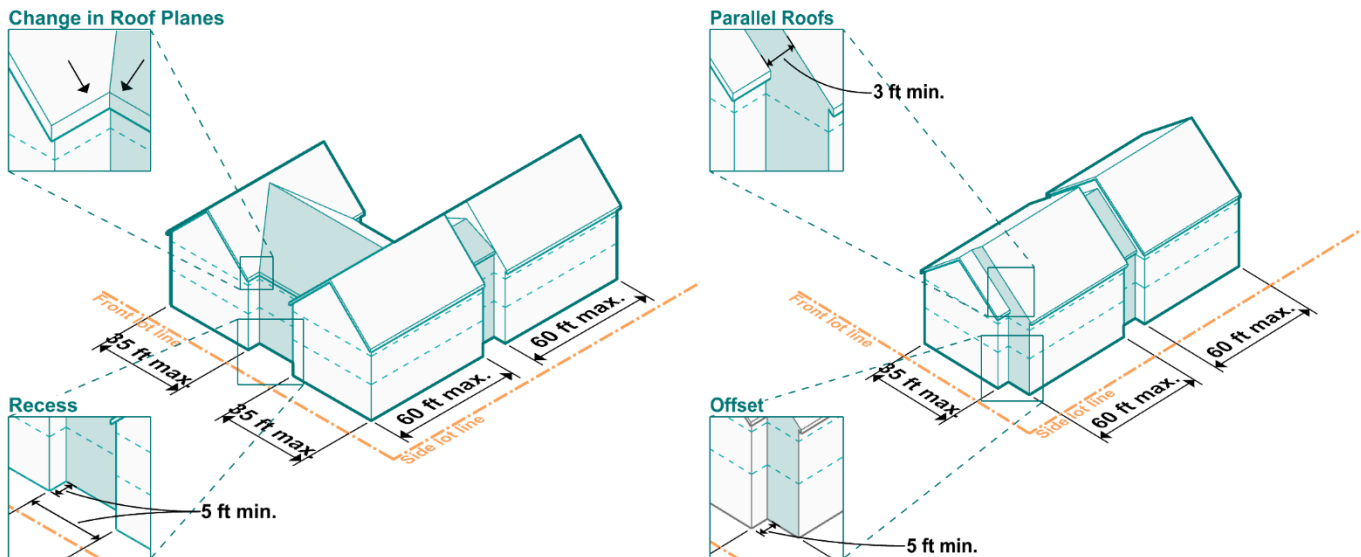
Facade Articulation Example for a Building with Perpendicular Roofs
